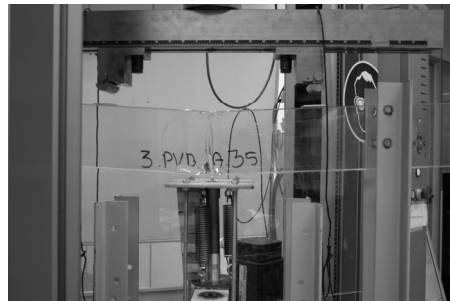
Typical final failure in 3.PVB.A specimen (after resistance test on specimen with model level III damage).
